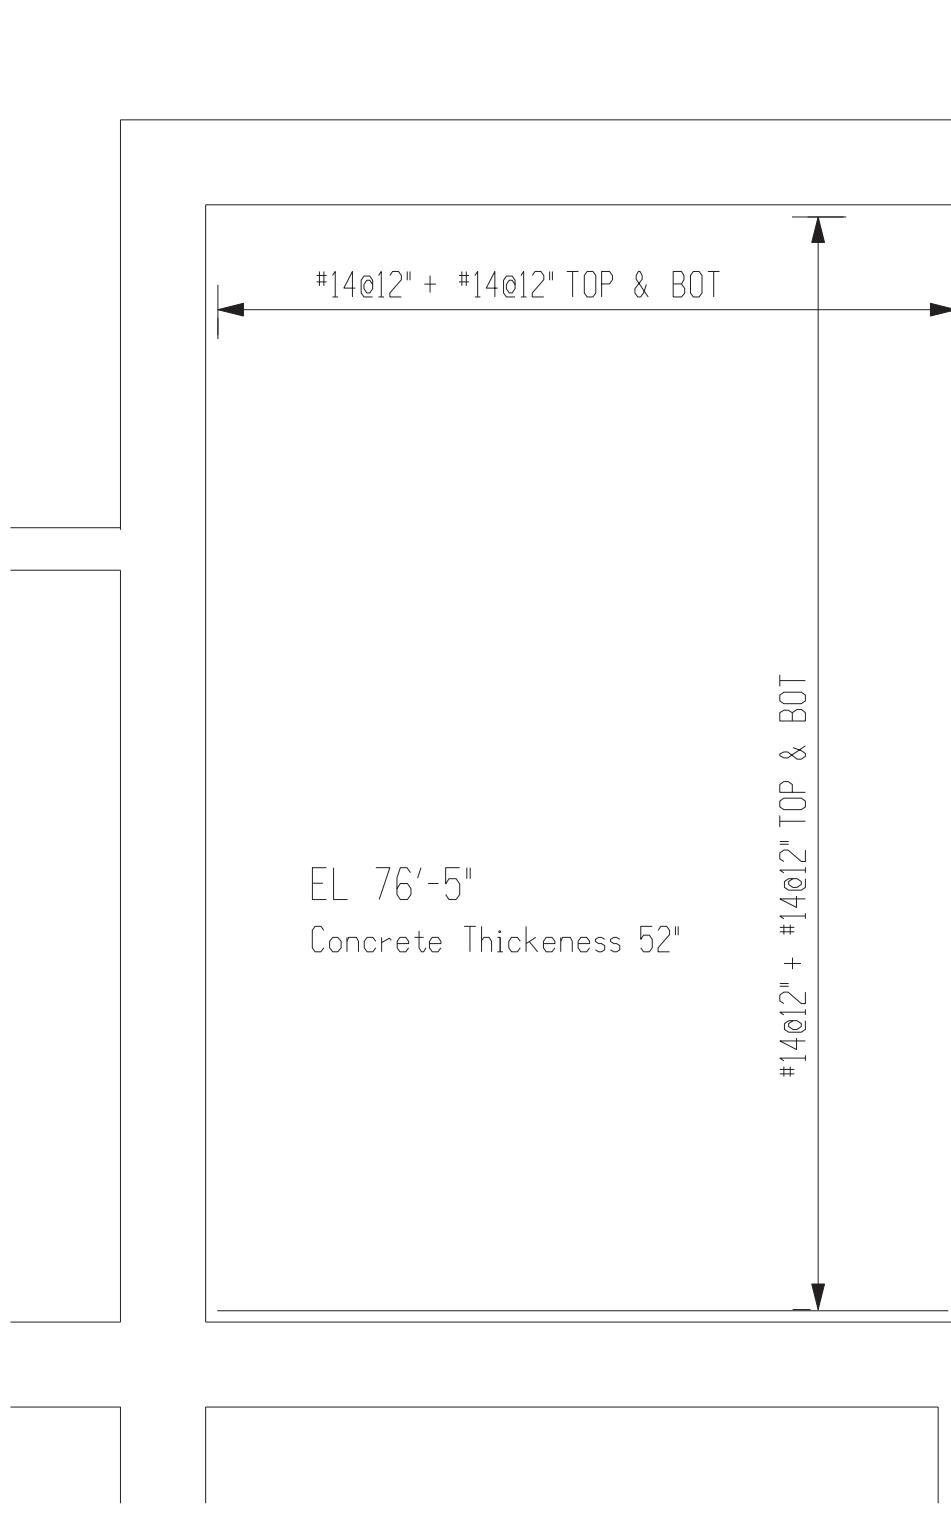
Typical Reinforcement in Emergency Feedwater Pit Slab – AREA 4
